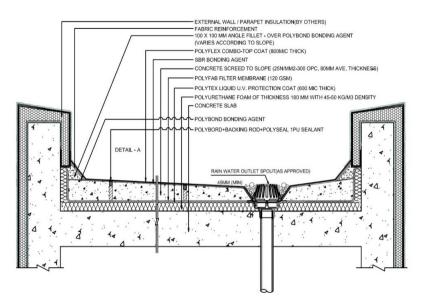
Combo roof section typical details source: Dubai Municipality, 2020
